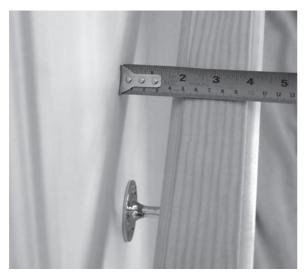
Allow 40 mm of finger room between the handrail and the wall.
